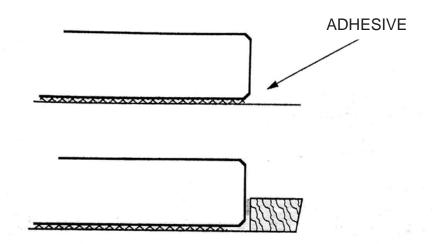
A - Slab or Sitting Hearths set above or into typical flooring
